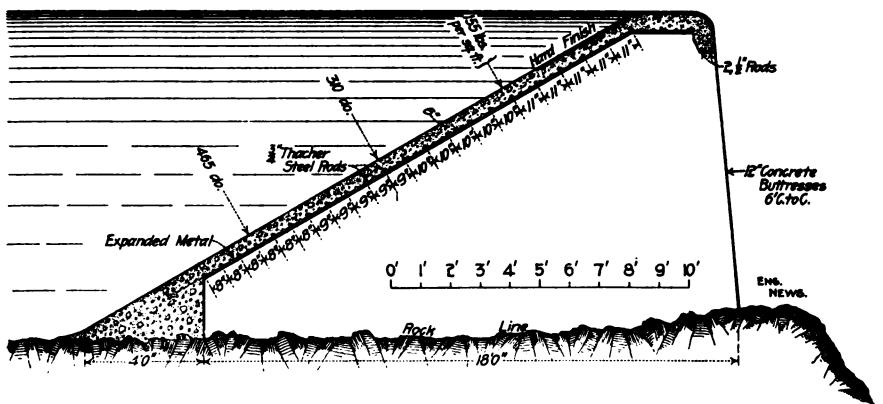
Section of Armored Concrete Dam, Theresa, N. Y.
